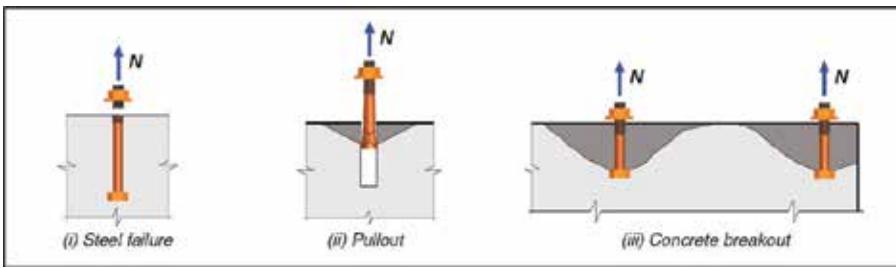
Failure modes for an individual anchor per ACI 318-19(22), Fig. R17.5.1.2⁶
